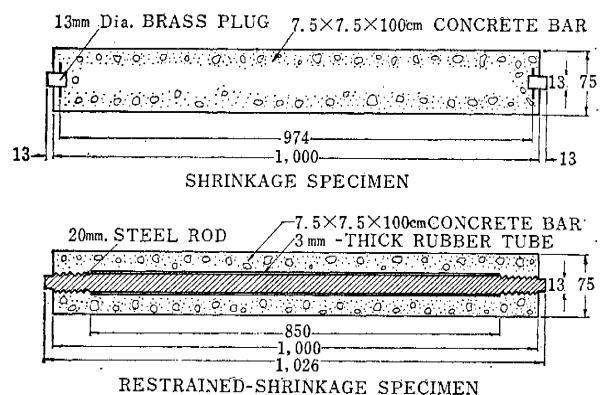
Shrinkage and Restrained-Shrinkage Specimens for Internal Restraining Method, unit=mm.
